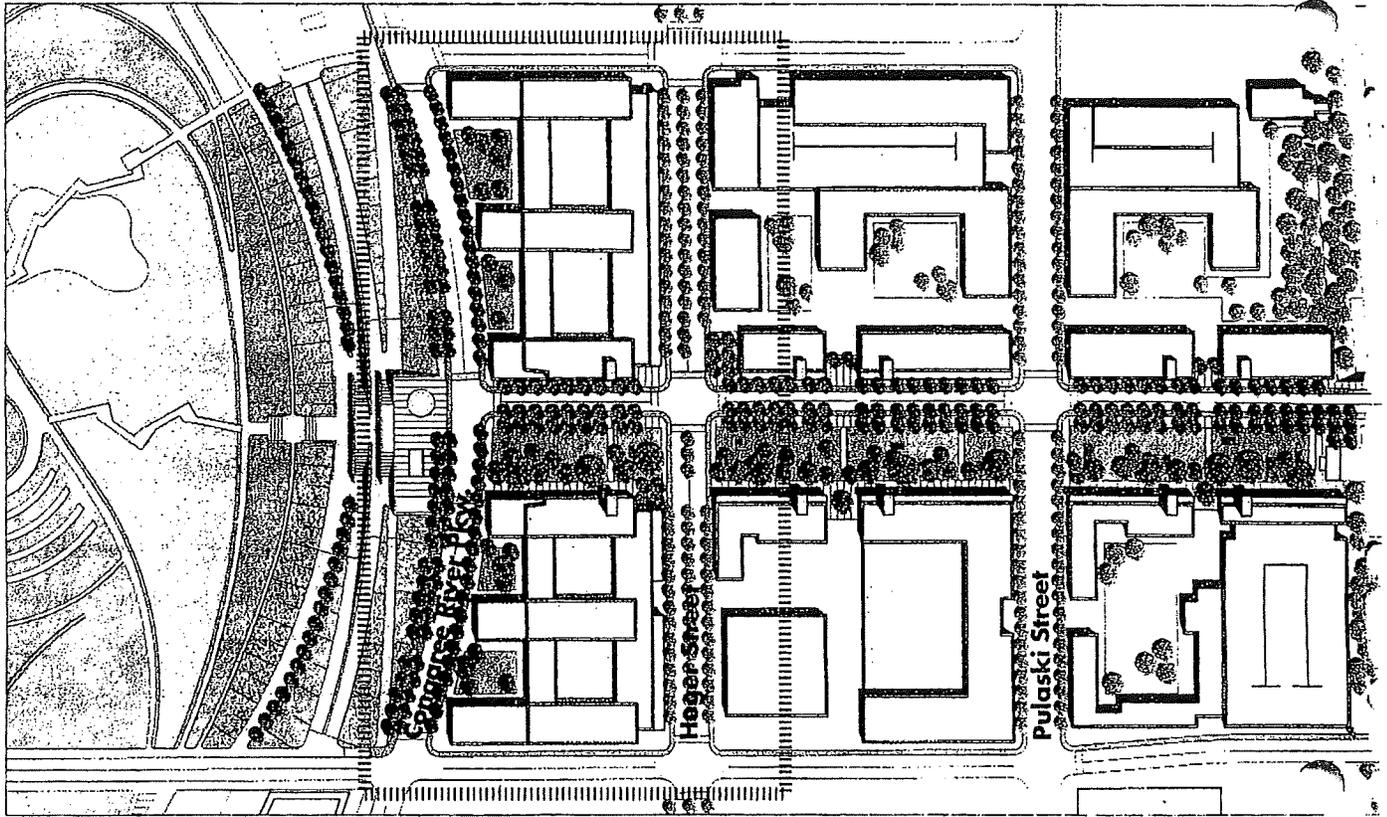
GREENE STREET CORRIDOR ILLUSTRATIVE PLAN, WITH GREENE STREET OVERLOOK HIGHLIGHTED IN RED
